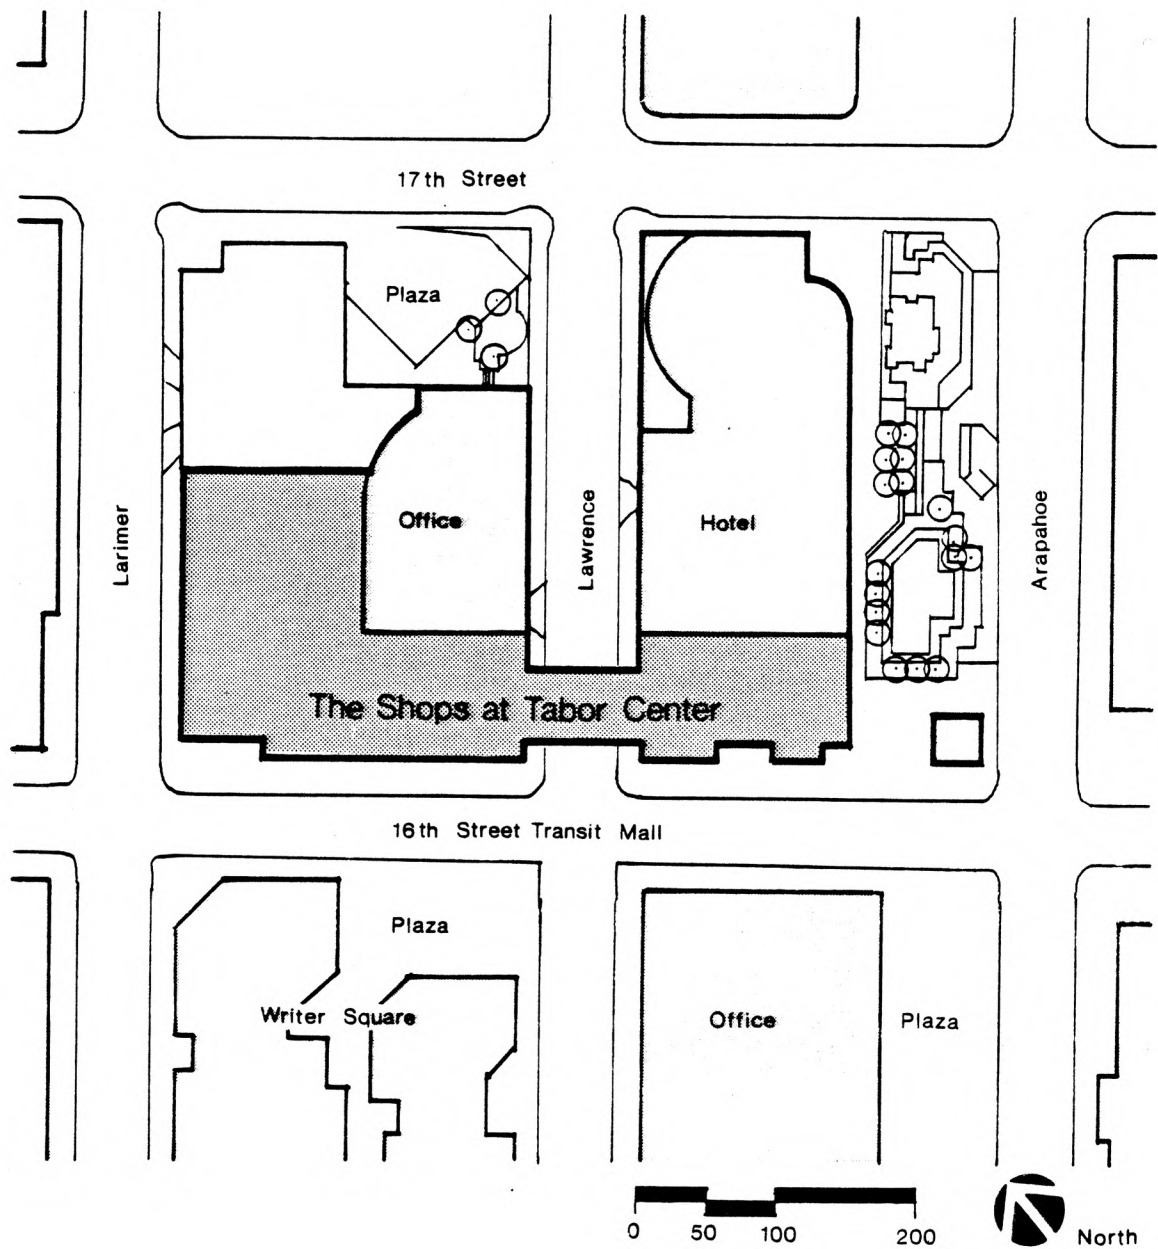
Site Plan of the Shops at Tabor Center
